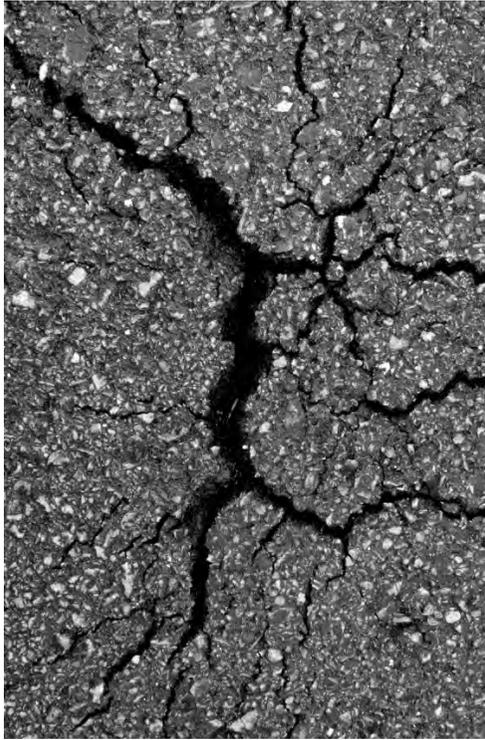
Photo of Cracking on Pavement Surface
